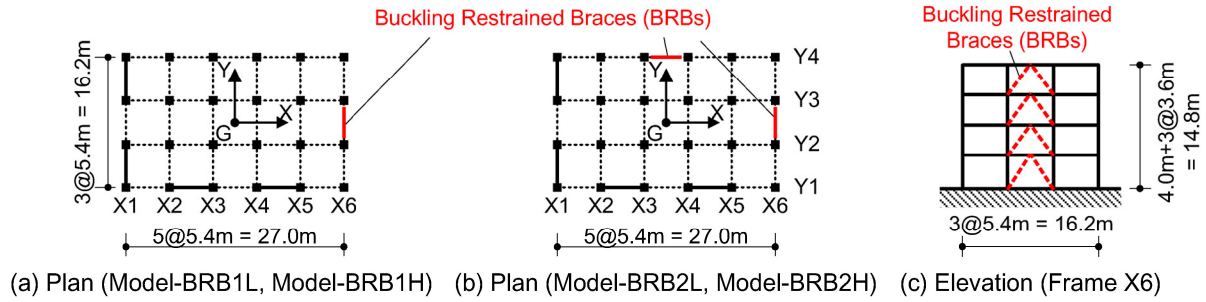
Model building with BRBs (Model-BRB1L, BRB1H, BRB2L and BRB2H)
